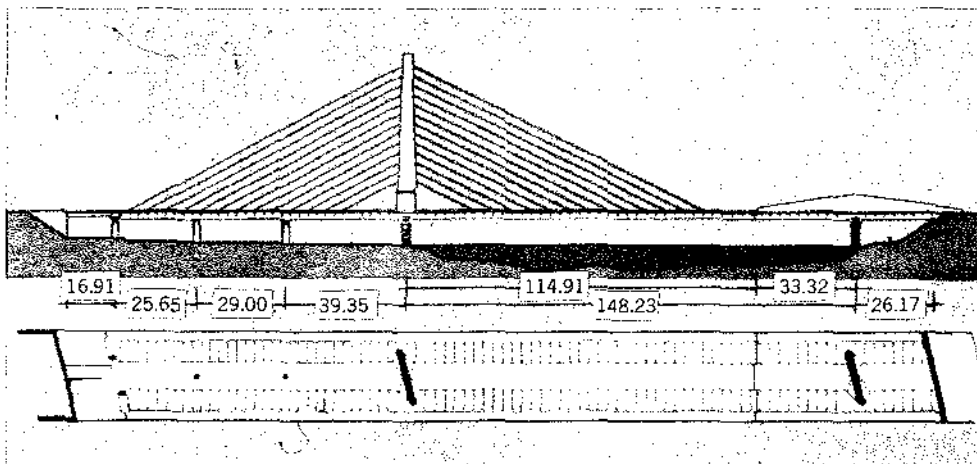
Mainbrücke, elevation and plan, from reference 12.
